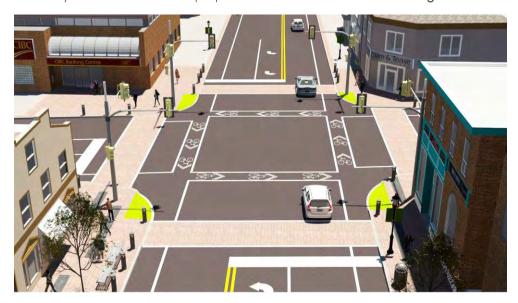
Interim Solution: Looking South on Queen Street Approaching Intersection with King Street
